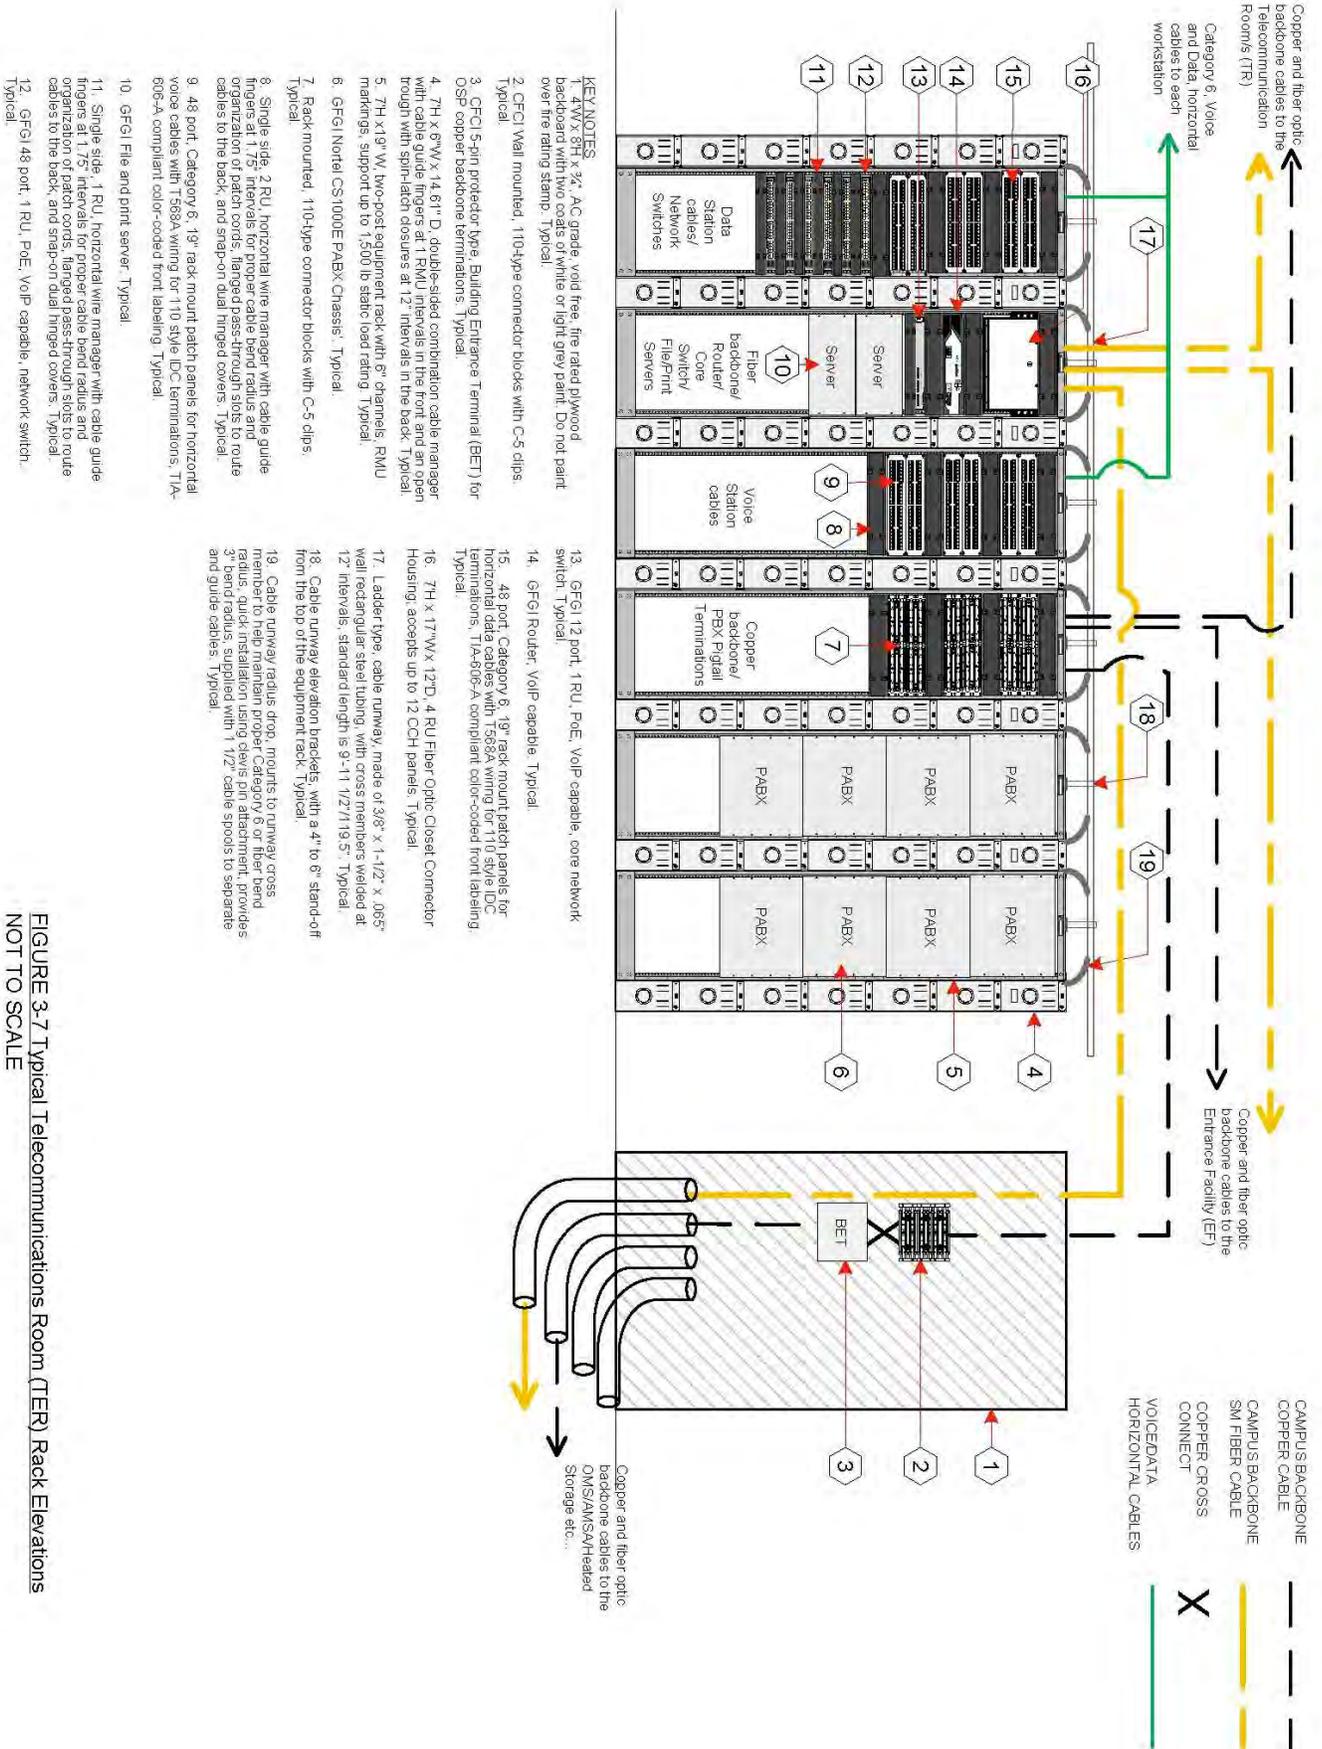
Typical Telecommunications Room (TER) Rack Elevations
